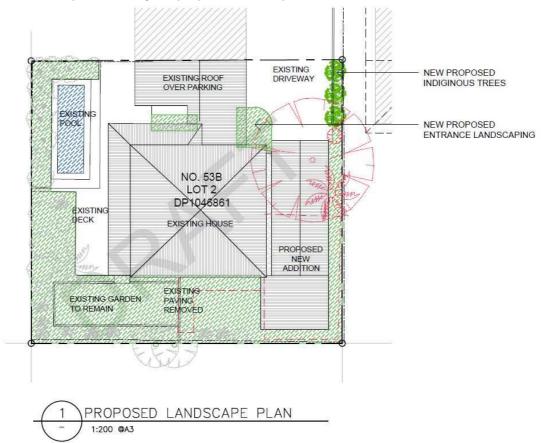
A portion of the proposed architectural proposed landscape plan showing the proposed new addition as the works scope. Note also, the three new proposed indigenous shrubs proposed along the eastern boundary as replacement shrubs.
